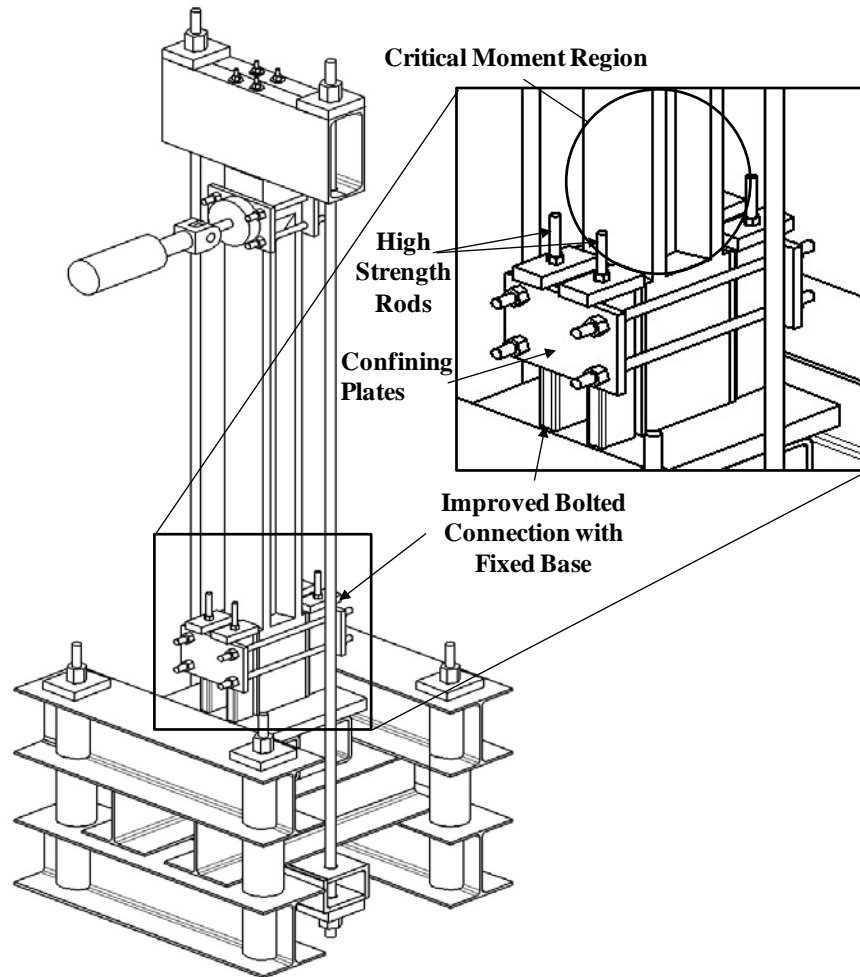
Laboratory test setup with bolted connection at the base for UHPC test unit L2
